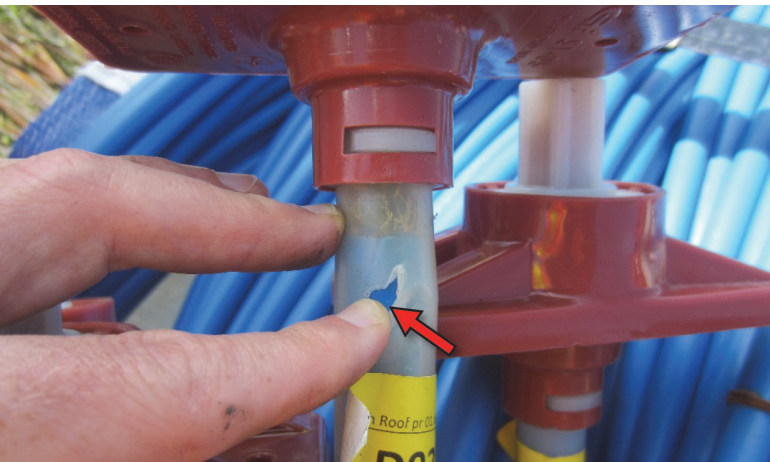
Damaged PT sleeve prior to concrete placement.
